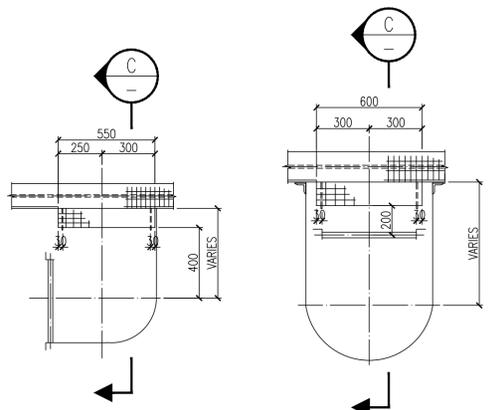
ALTERNATIVE (SCALE 1:20)
